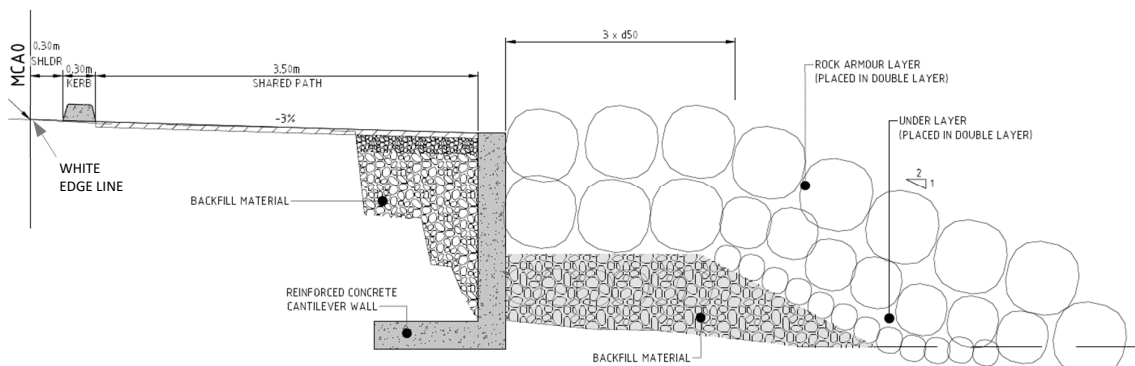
Revetment with reinforced concrete cantilever wall. Note a geotextile underlay (not shown) will be included between backfill and underlayer. [Source: Stantec 2017b].
